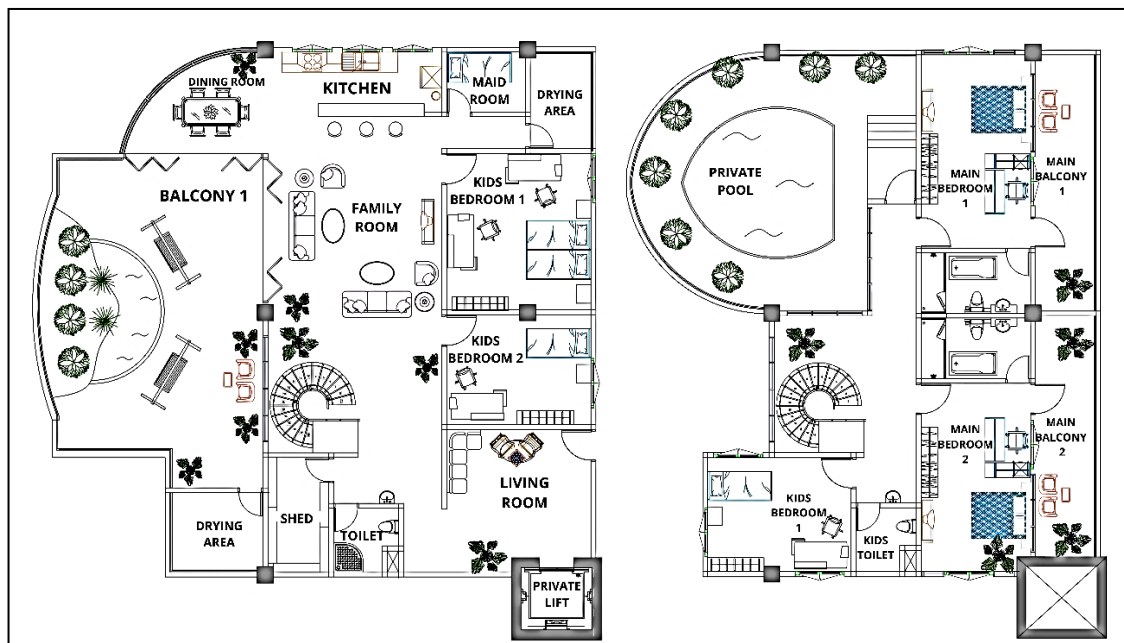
(a) 1st-floor Penthouse (b) 2nd-floor Penthouse
